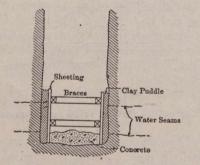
First Method of Handling Water in Core-Wall Ditch.
